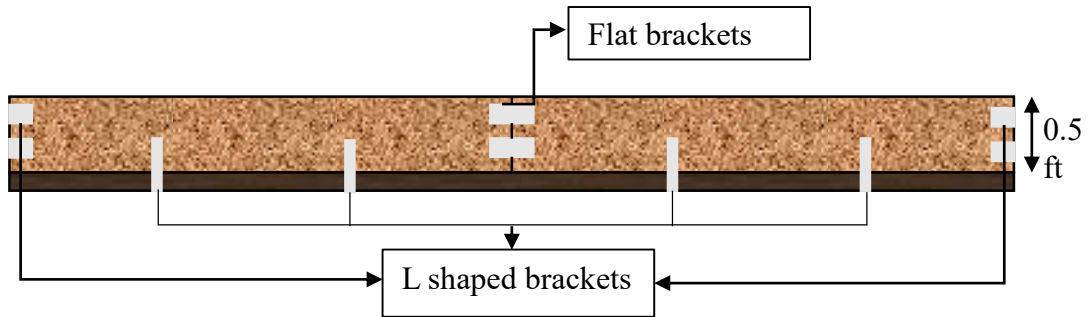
3.3.3.3 Side view of the wooden mold made in house to cast a slab with special arrangements.
